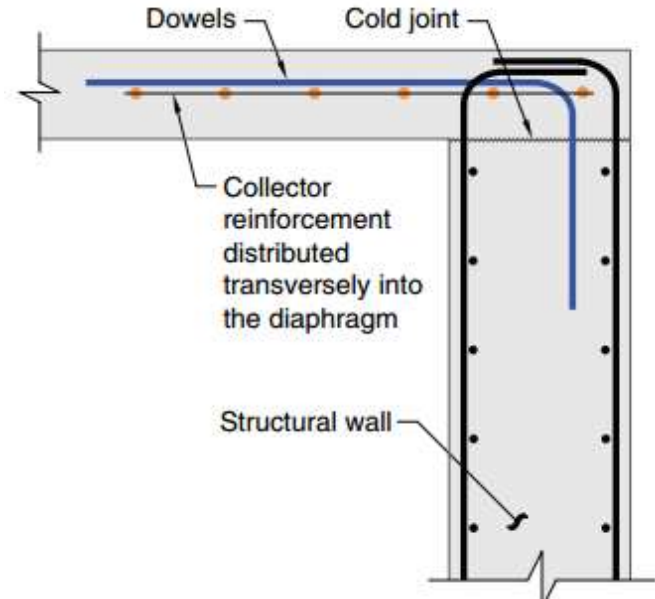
Typical detail showing dowels provided for shear transfer to a structural wall through shear-friction.
